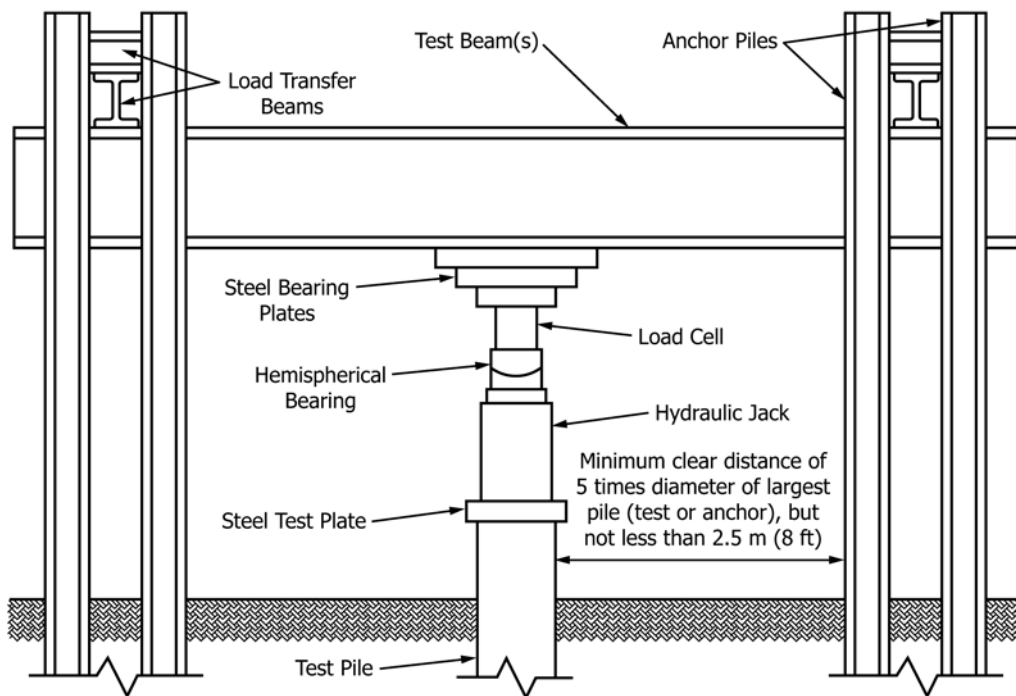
Schematic of Hydraulic Jack Acting Against Anchored Reaction Frame
